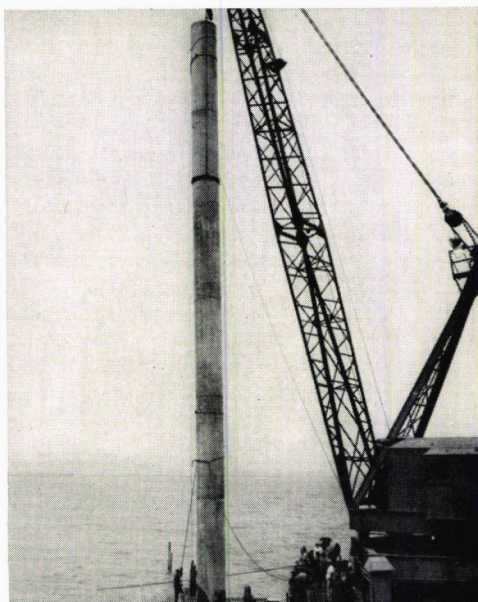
The first 96-foot long, 54-inch diameter test pile being positioned.
